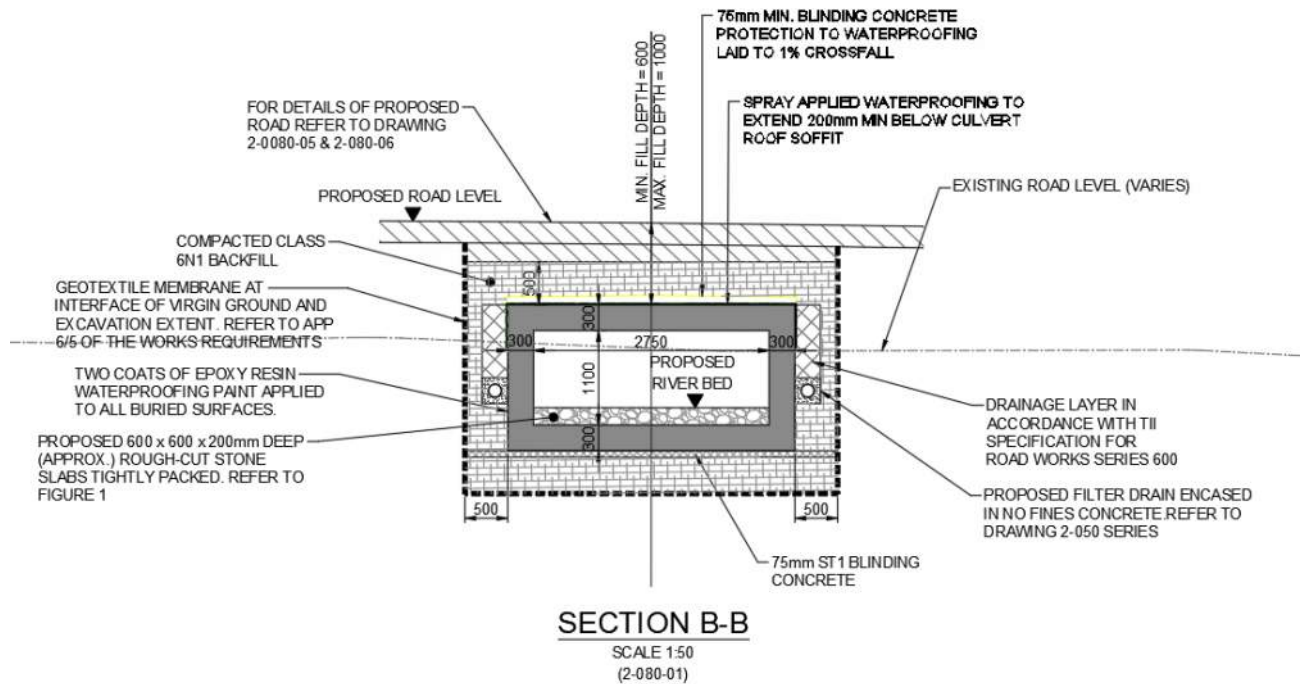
Cois na Gleann Culvert Typical Cross Section
